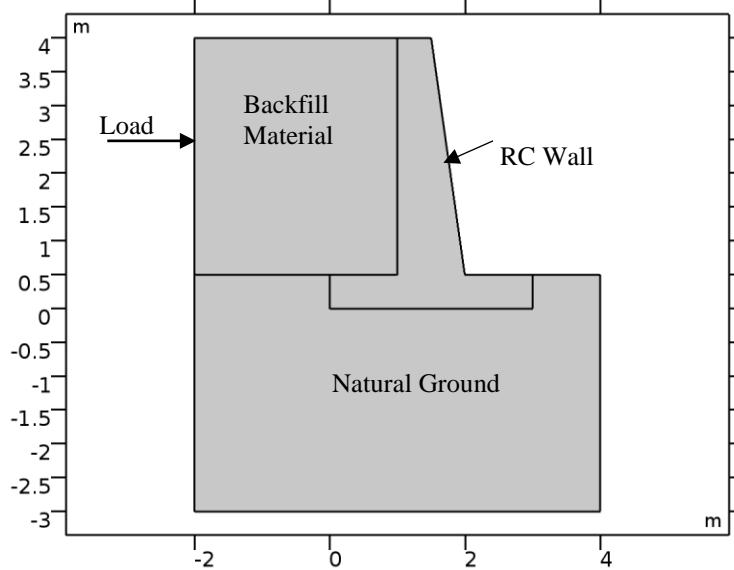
Model Geometry of a Tapered RC Retaining Wall
